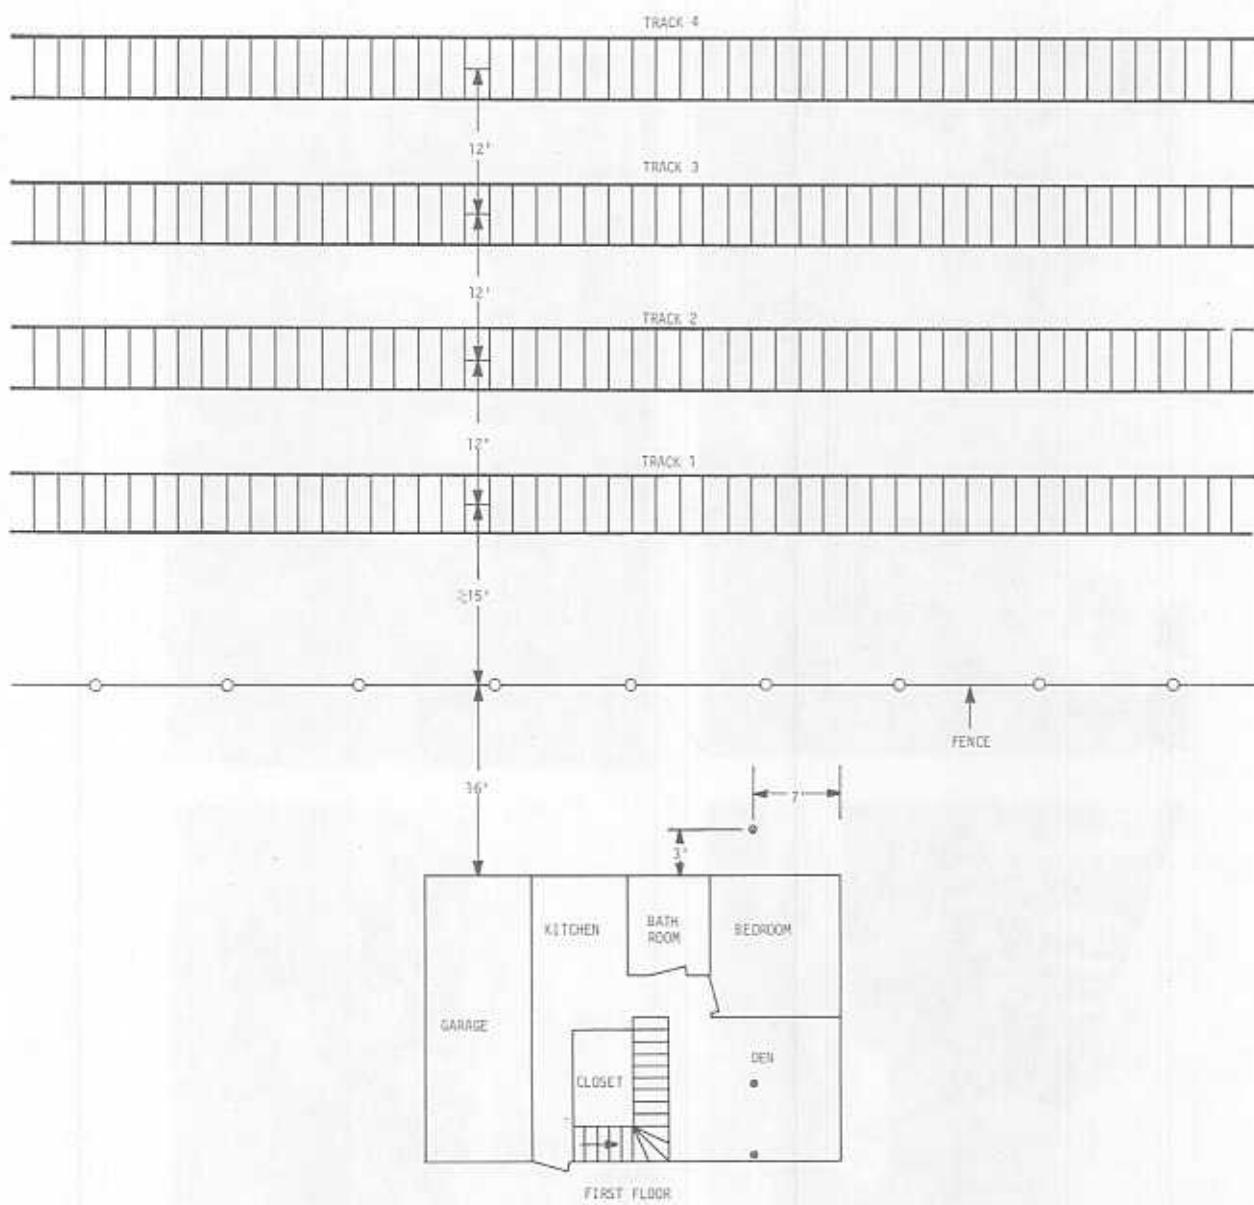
MEASUREMENT SITE PLAN VIEW, NYCTA BRIGHTON LINE
